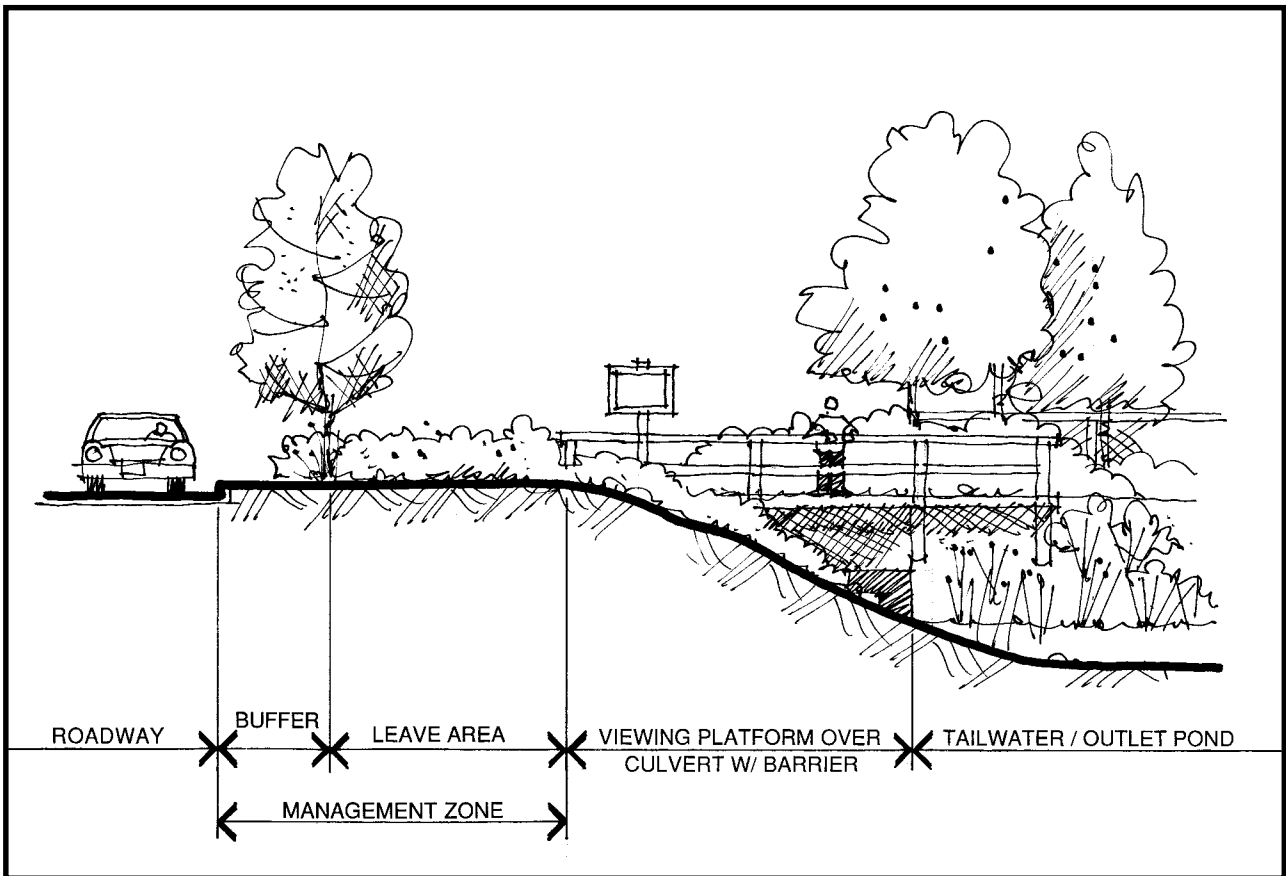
Viewing Deck Overlooks Tailwater/Outlet Pond
